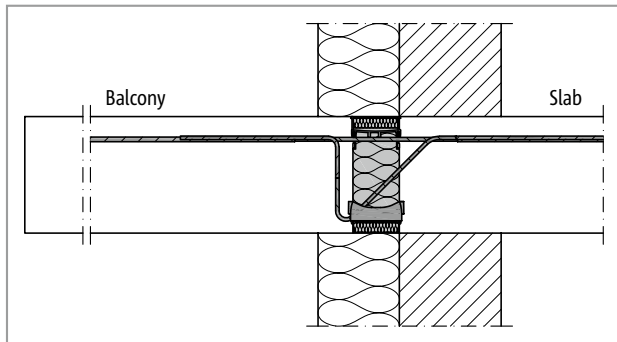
Schöck Isokorb® T type K: Connection with thermal insulation composite system (TICS)
